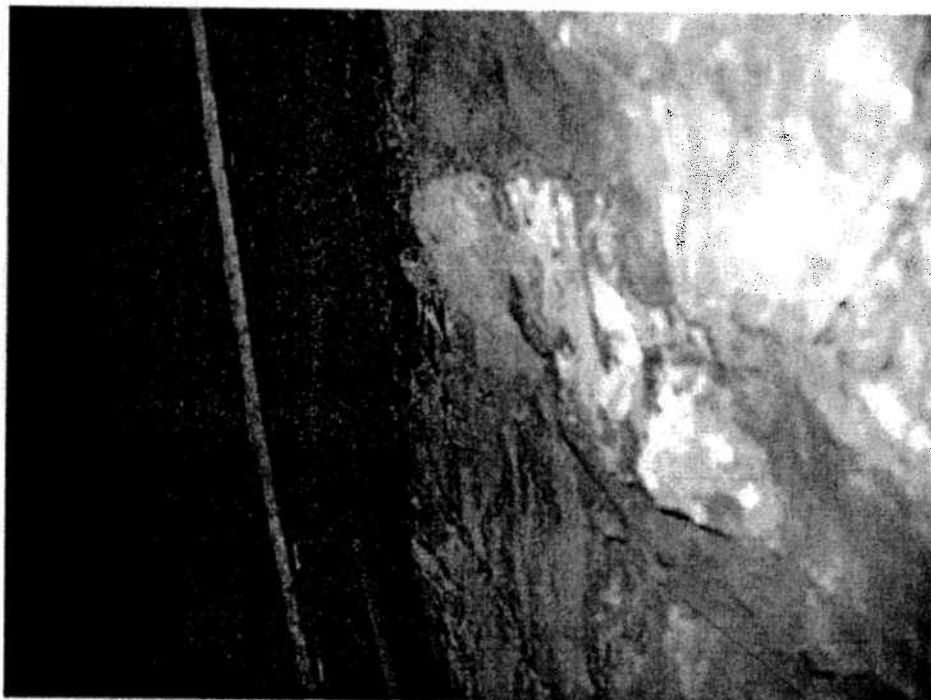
View behind a steel backstop at the south end of the IFR where the sand trap was formerly located.
